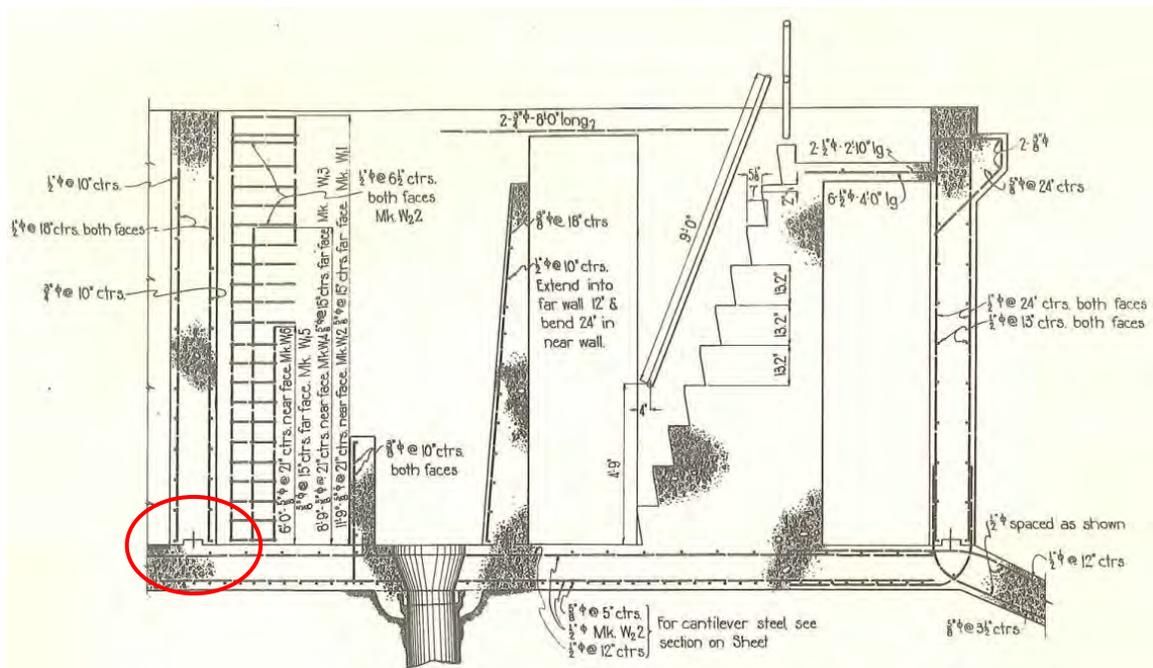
Inadequate Shear Wall to Foundation Connection
